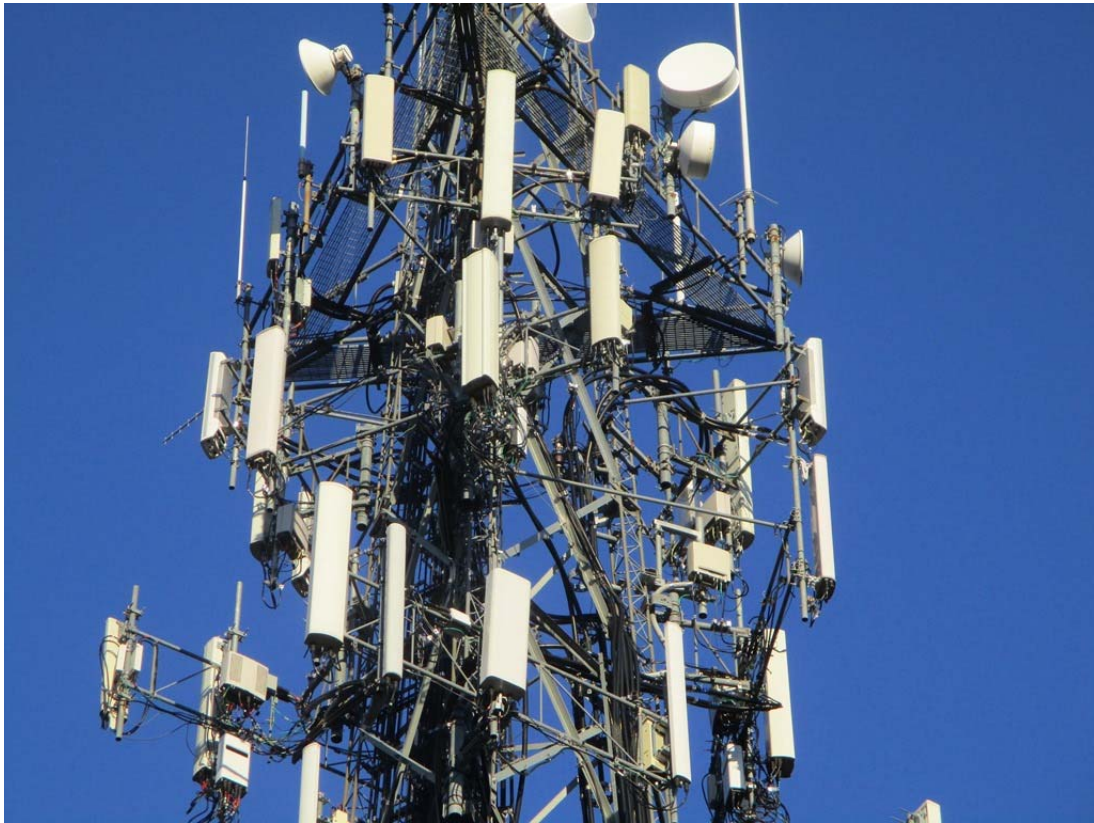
Photo illustrating the Tower with Appurtenances shown.
